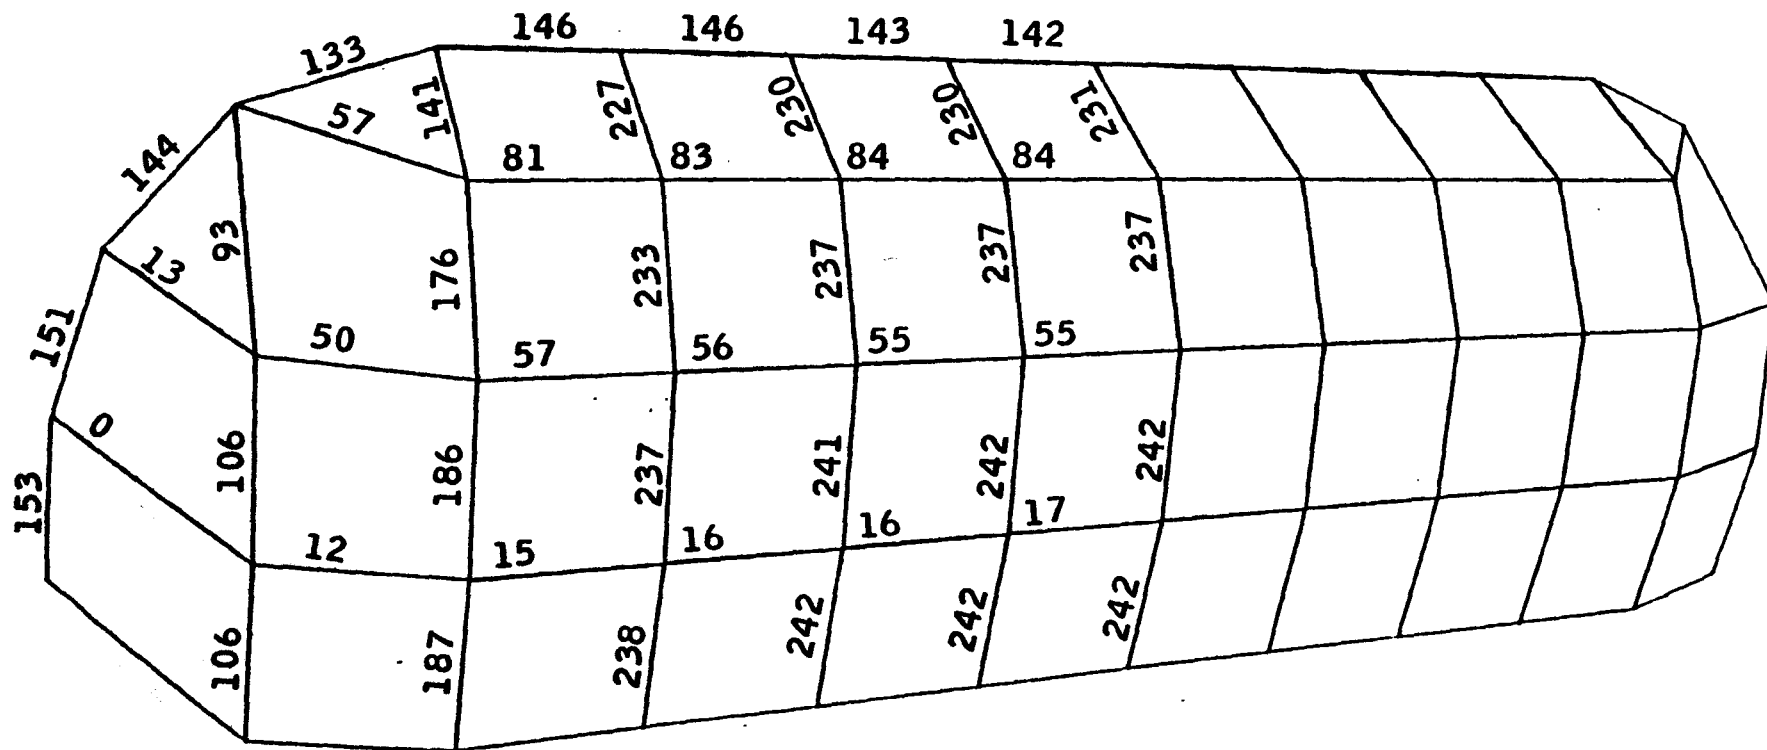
a2 - Tension forces in the cables (in kN).
